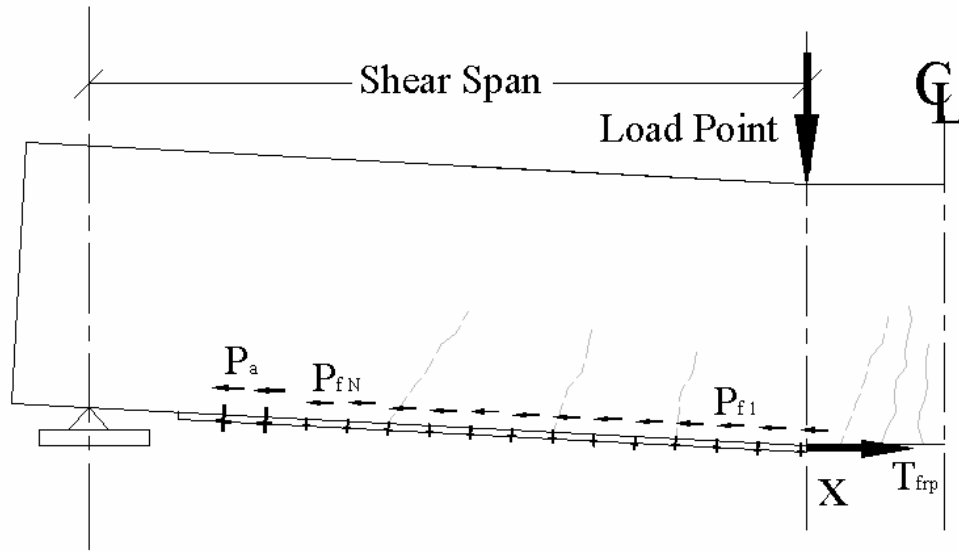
Transfer of force to the FRP strip through the individual fasteners and anchor bolts
